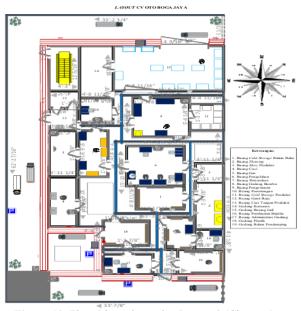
Floor Plan Alternative Layout 2 (Choosen)
